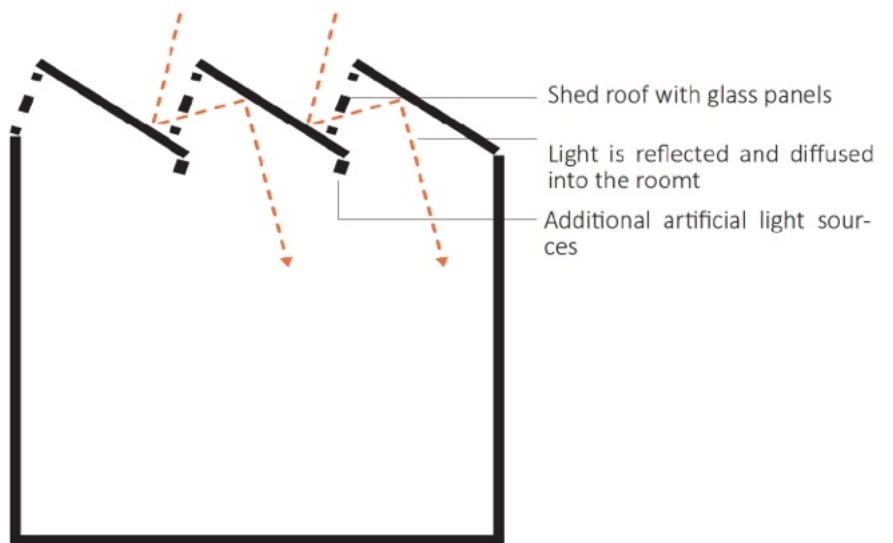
Exposure concept - Dia Art Foundation, Open Office Arts, New York, 2011
